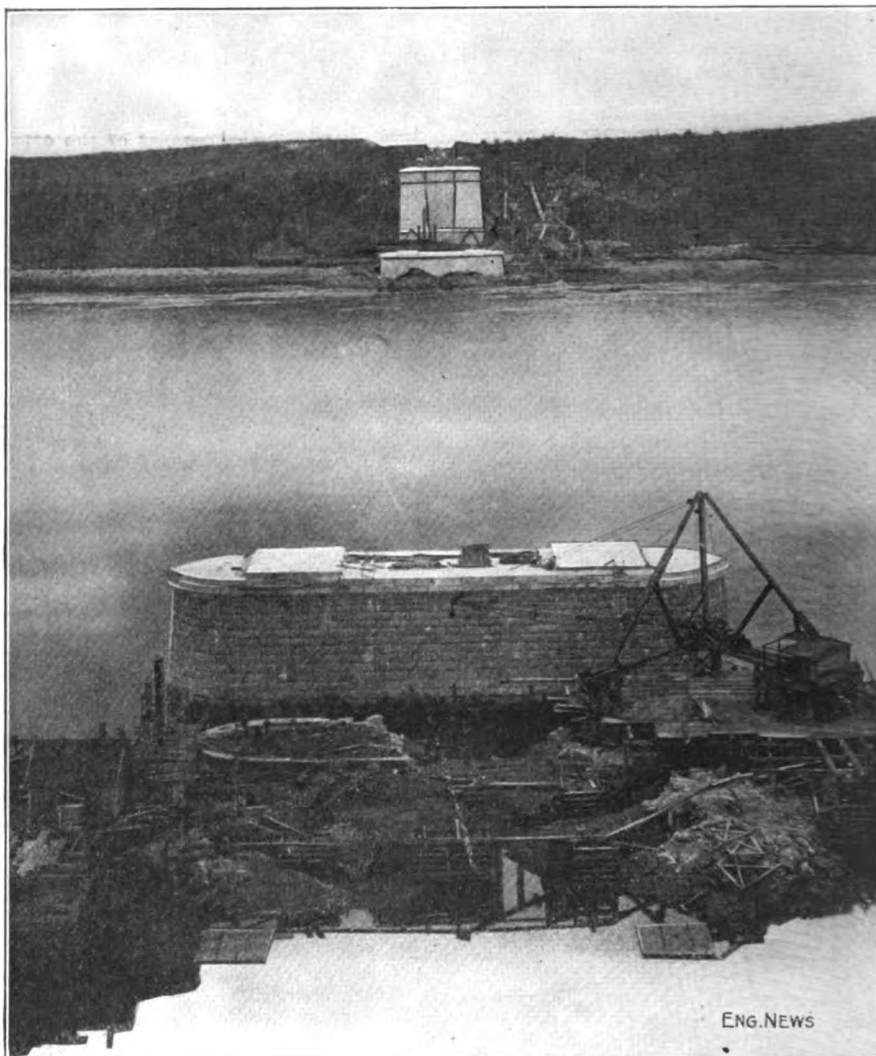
COMPLETED SUBSTRUCTURE OF NEW QUEBEC BRIDGE;
